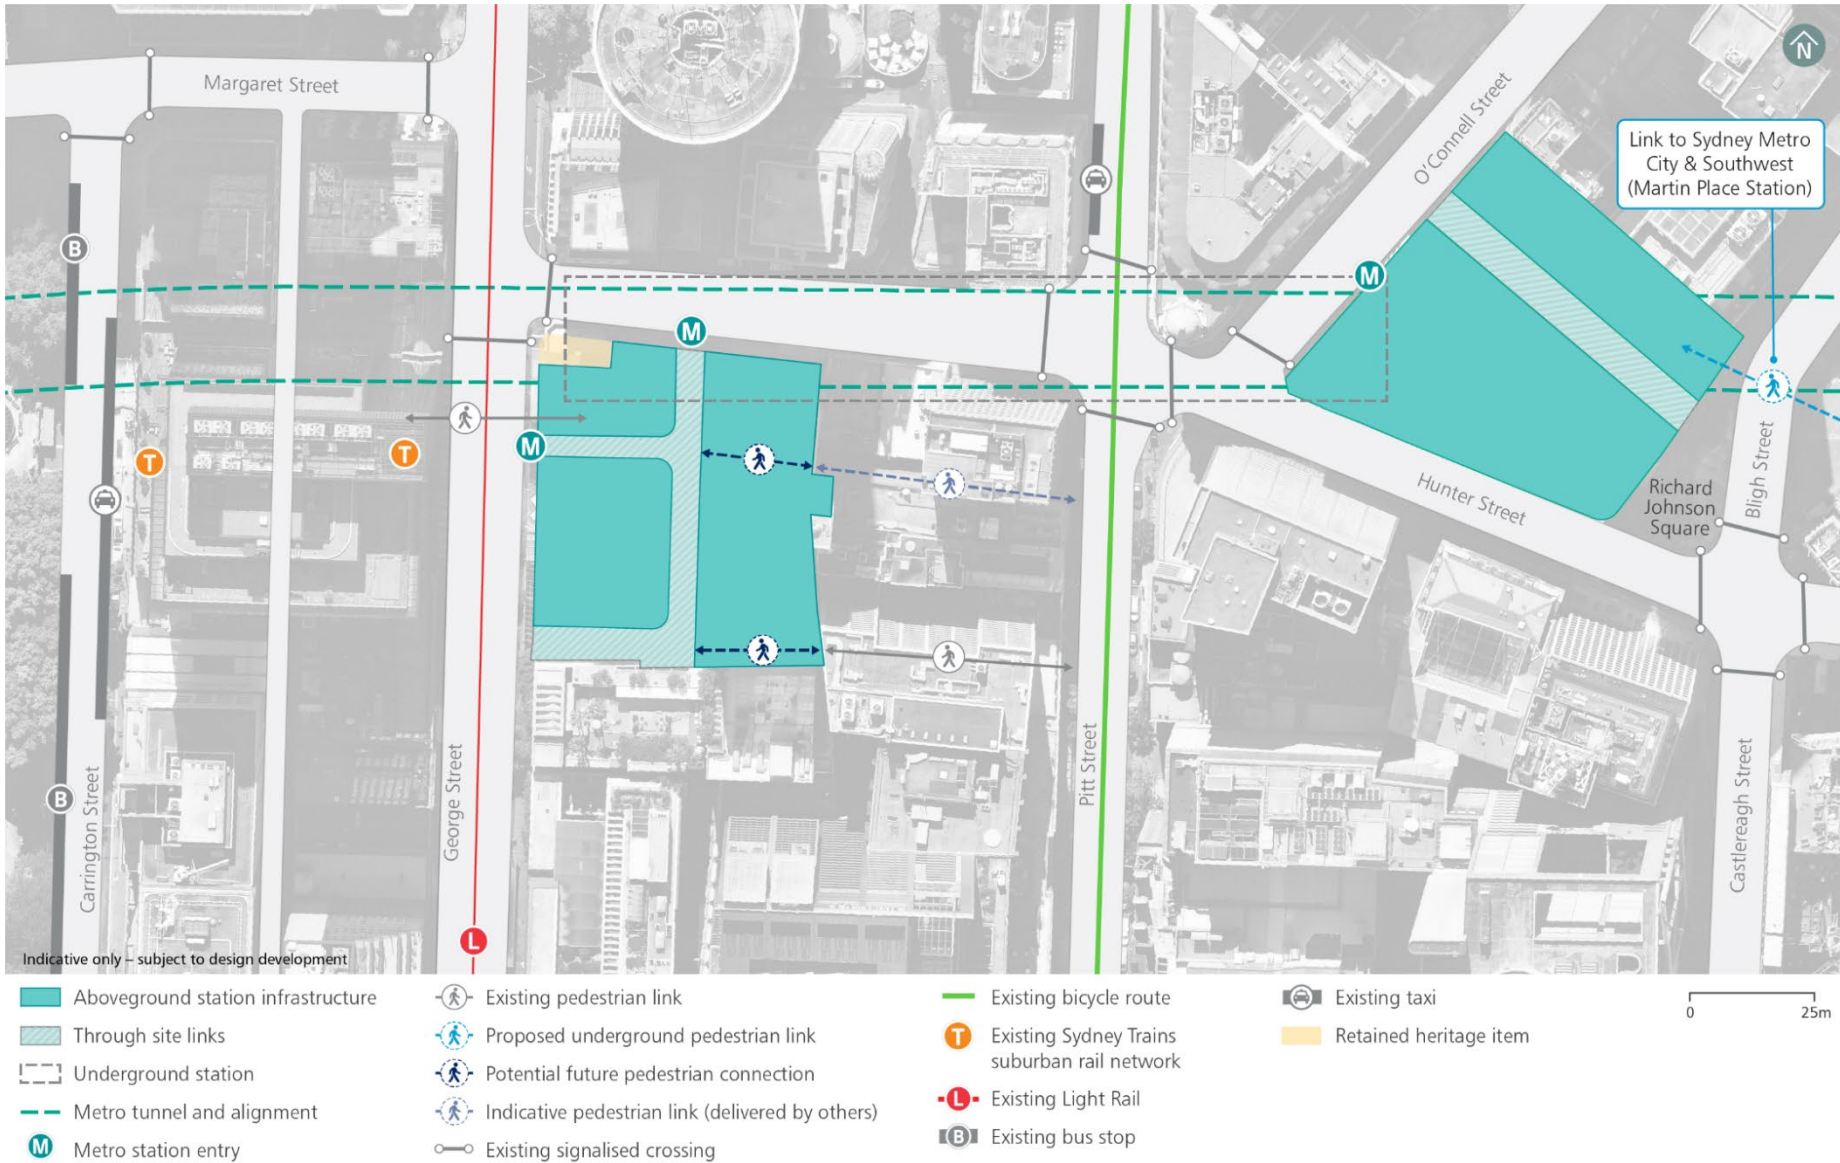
Indicative layout and key design elements – Hunter Street Station (Sydney CBD)
